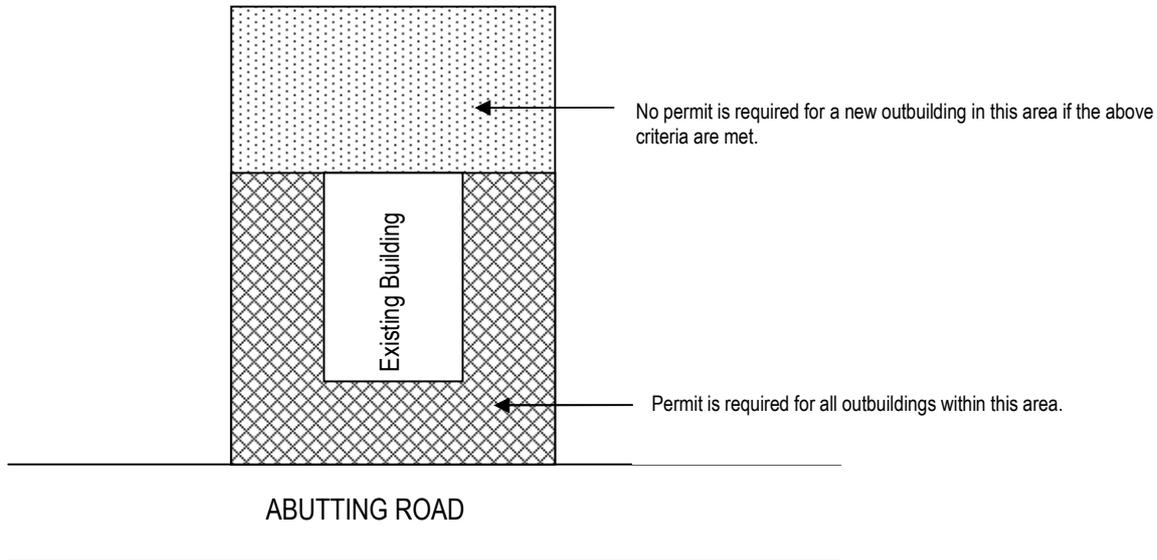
Exemptions for new outbuildings (carports/garages/sheds) for 'contributory' places not on a corner site within the Heritage Overlay.
